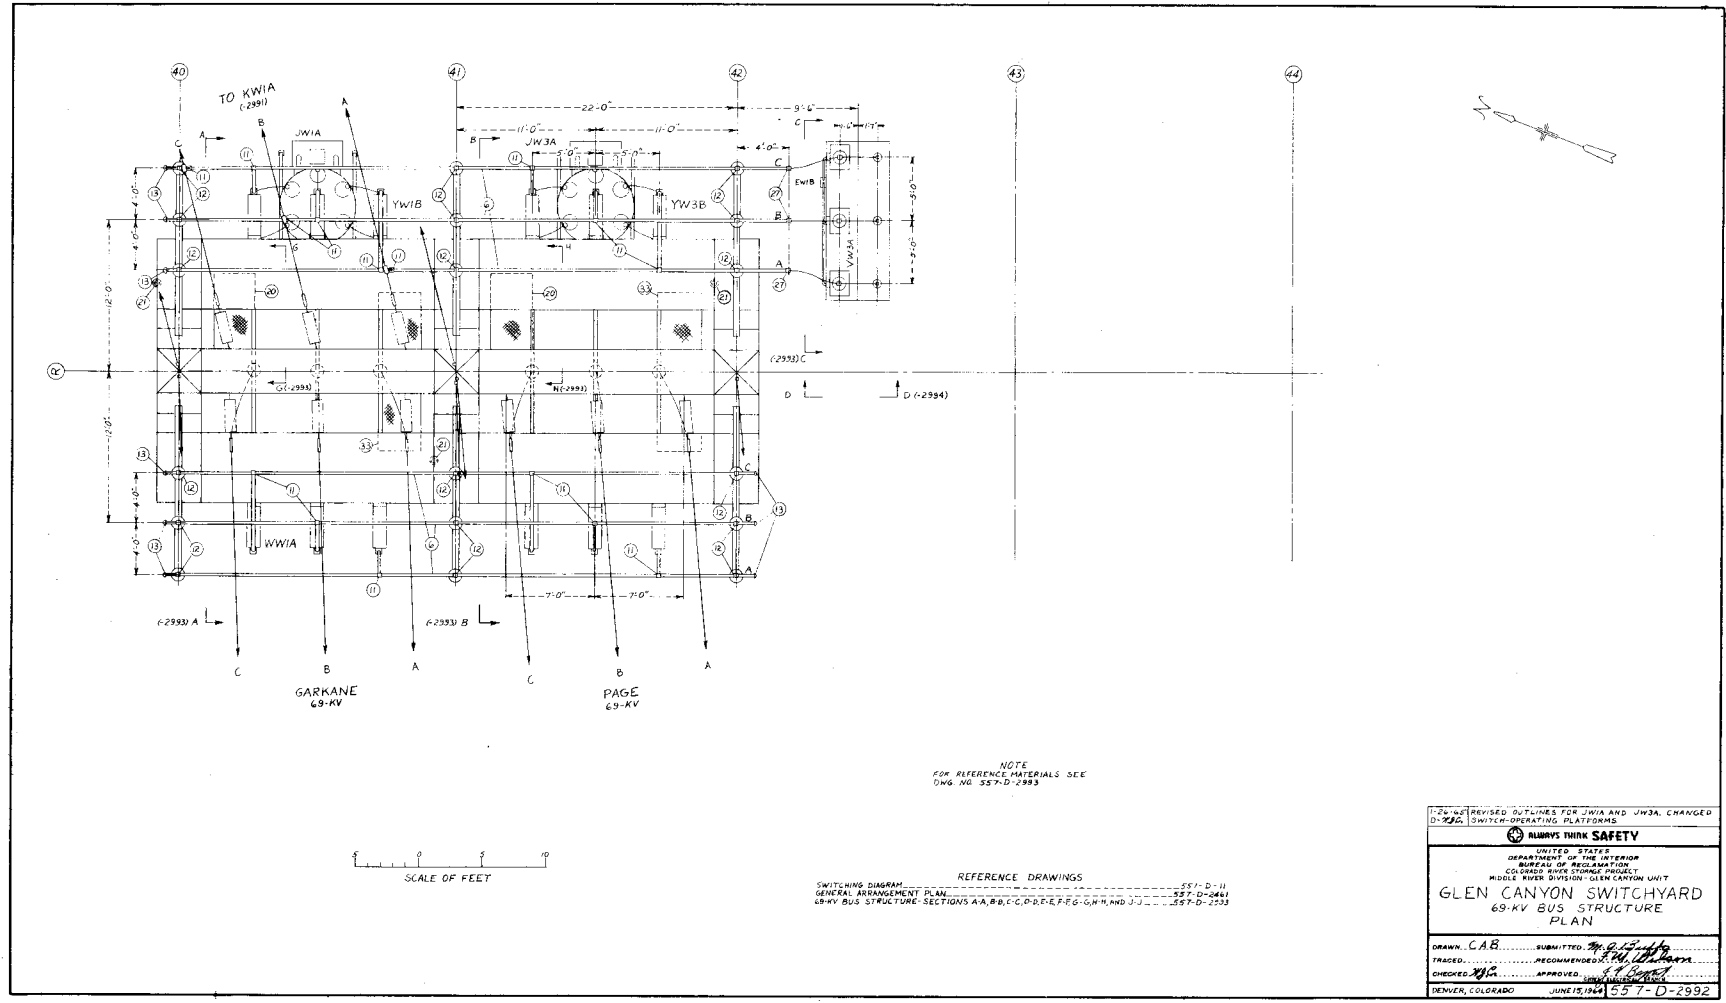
Switchyard 69-kilovolt bus structure—Plan.
